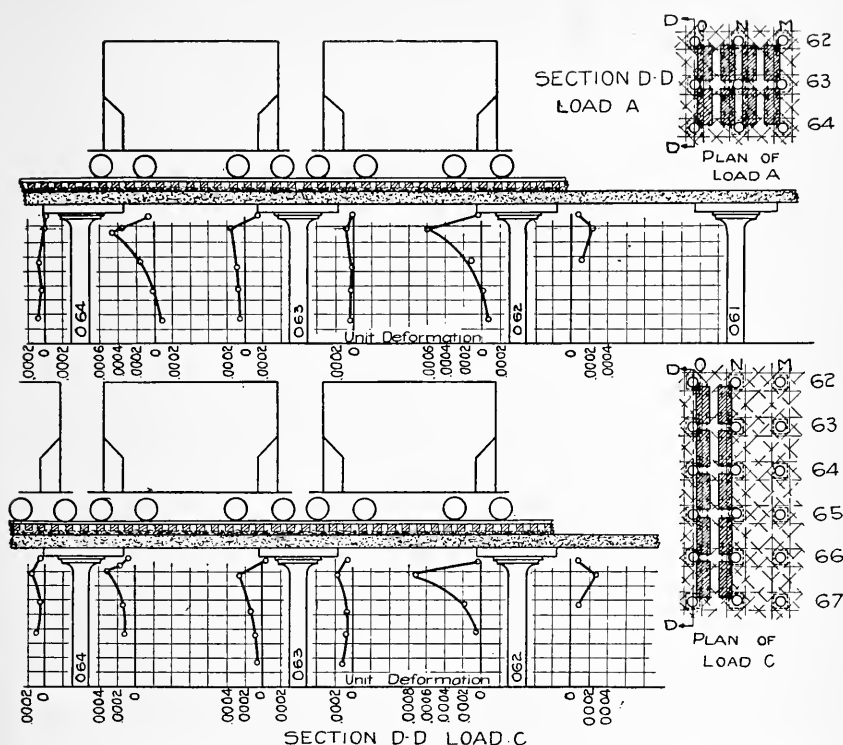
DEFORMATION IN COLUMNS CUT BY SECTION D-D (PARALLEL TO TRACKS) OF SOO TERMINAL STRUCTURE.
